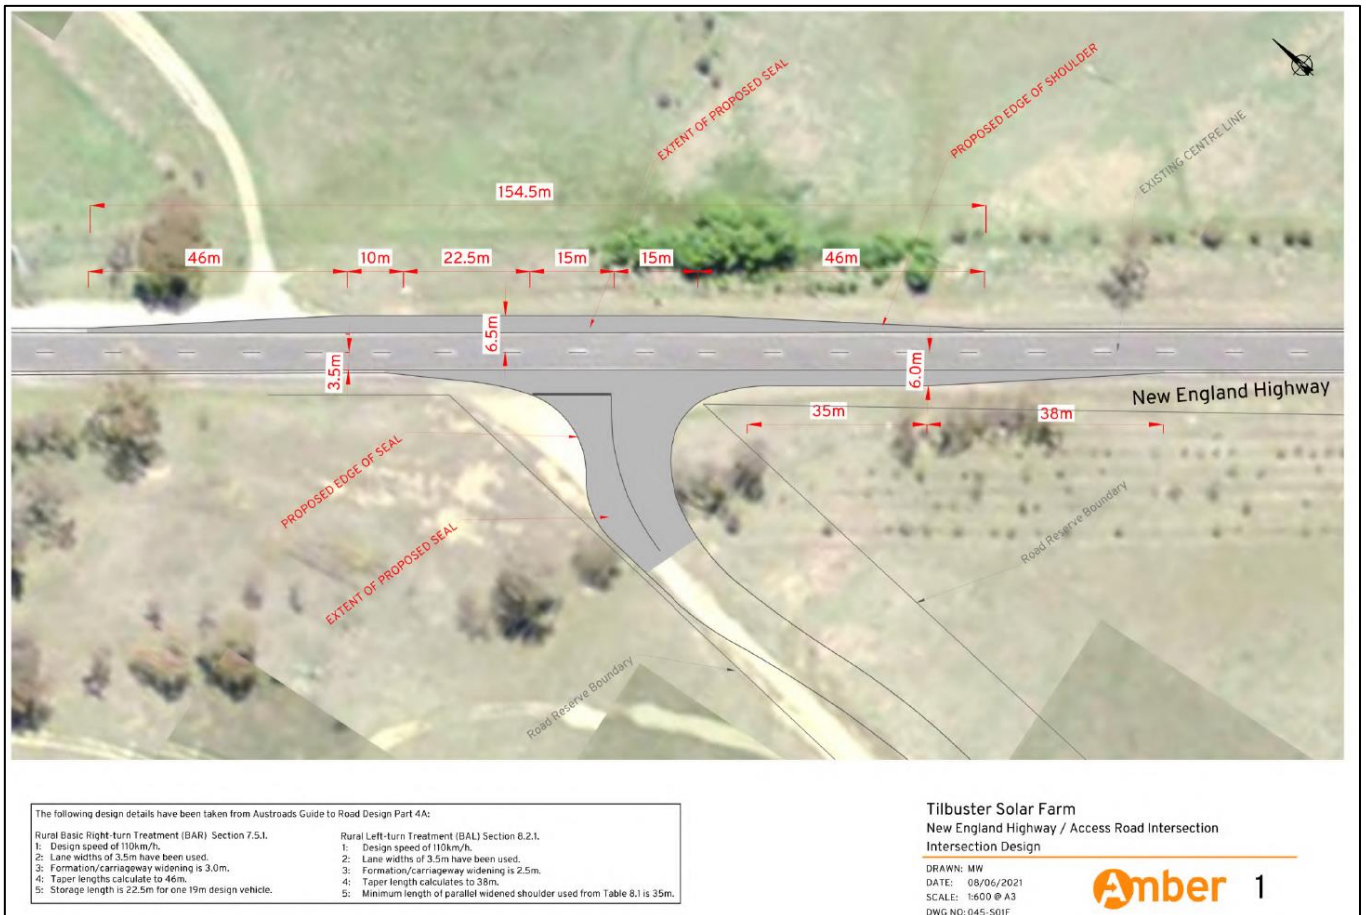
Proposed upgraded intersection layout (source: Amber Traffic and Transport Direction 2021)
